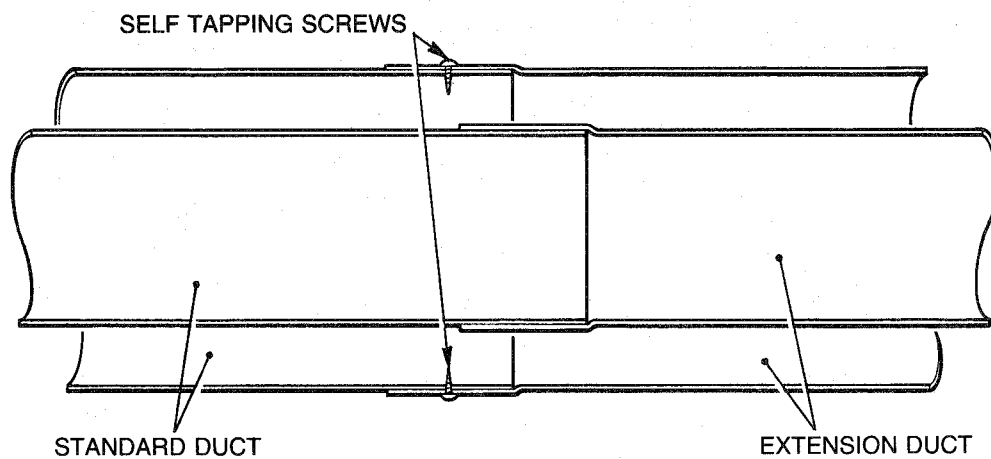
EXTENSION DUCT ASSEMBLY PROCEDURE
